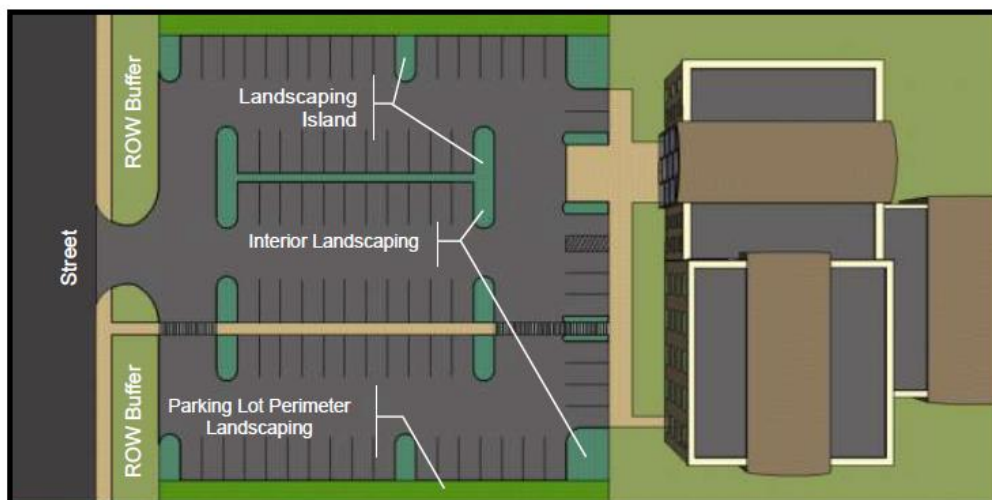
Island, Interior, and Perimeter Landscaping Plan View Illustration
